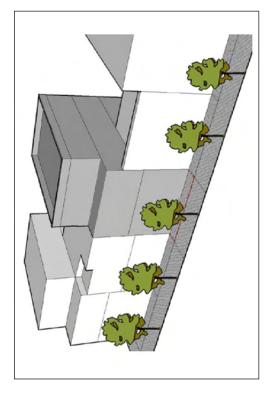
Where neighboring buildings are three stories or lower in height, newer taller buildings should consider matching lower facades to those of adjoining lower buildings with upper floors set back.
